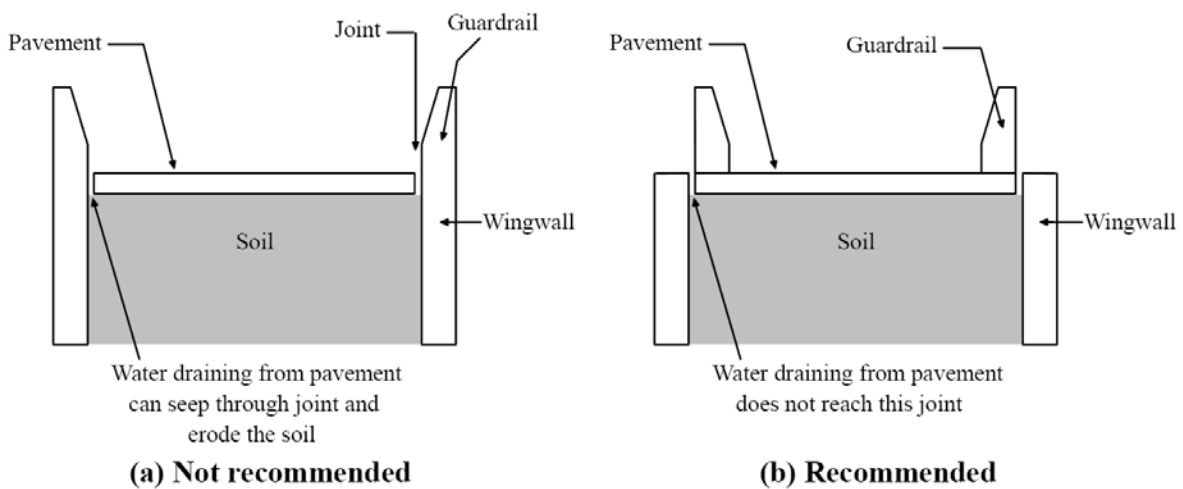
Approach Slab Joint Details at Pavement Edge (Briaud et al., 1997)
